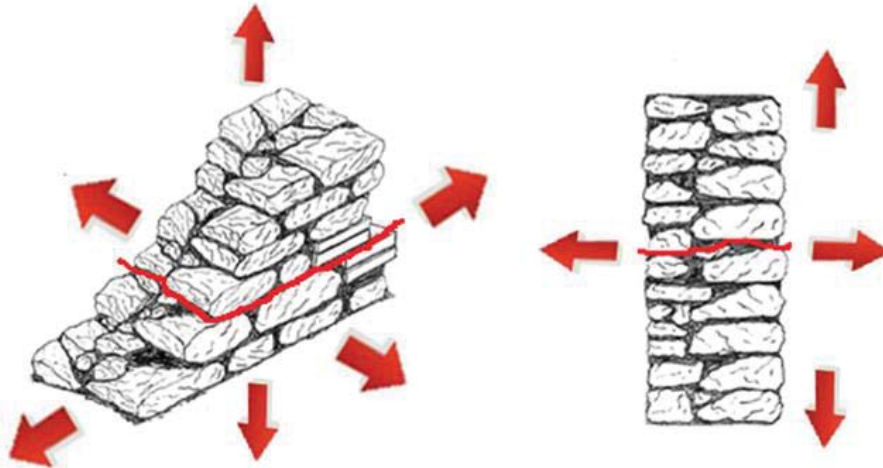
Possible sliding shear failure in uncut stone masonry caused by compression and decompression cycles due to vertical seismic action
